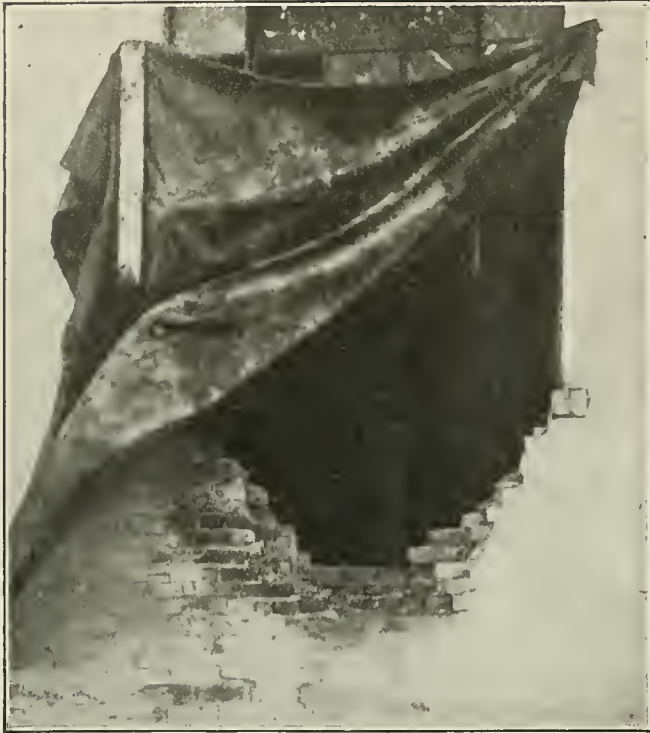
WALL TORN OUT BY EXPLODED FLYWHEEL
